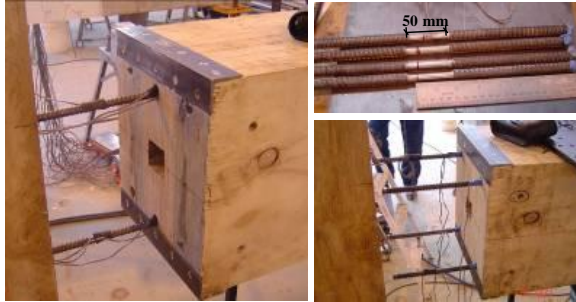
Exterior beam-column, wall-to-foundation, column-to-foundation specimens (Palermo et al. 2006, WCTE).
